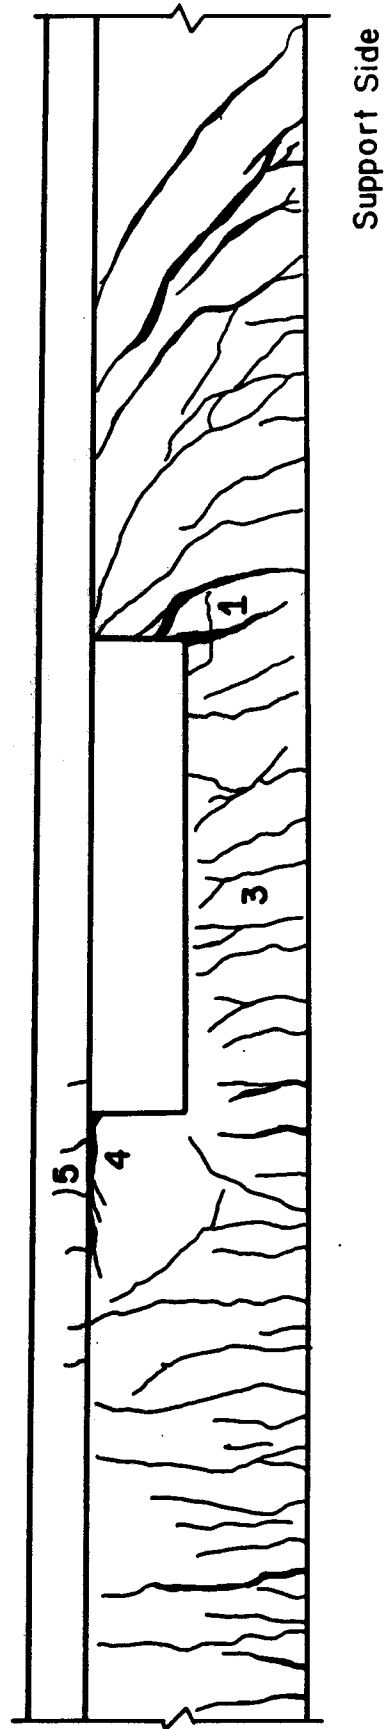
Crack Pattern - BEAM B2.
